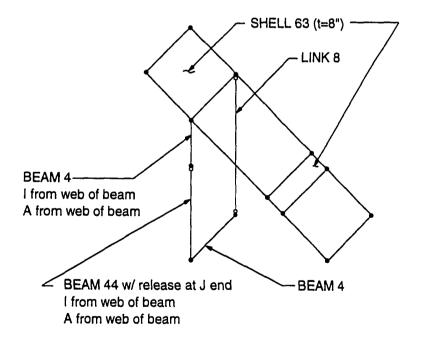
Finite element model of laterally continuous bridge system (Model 3).
